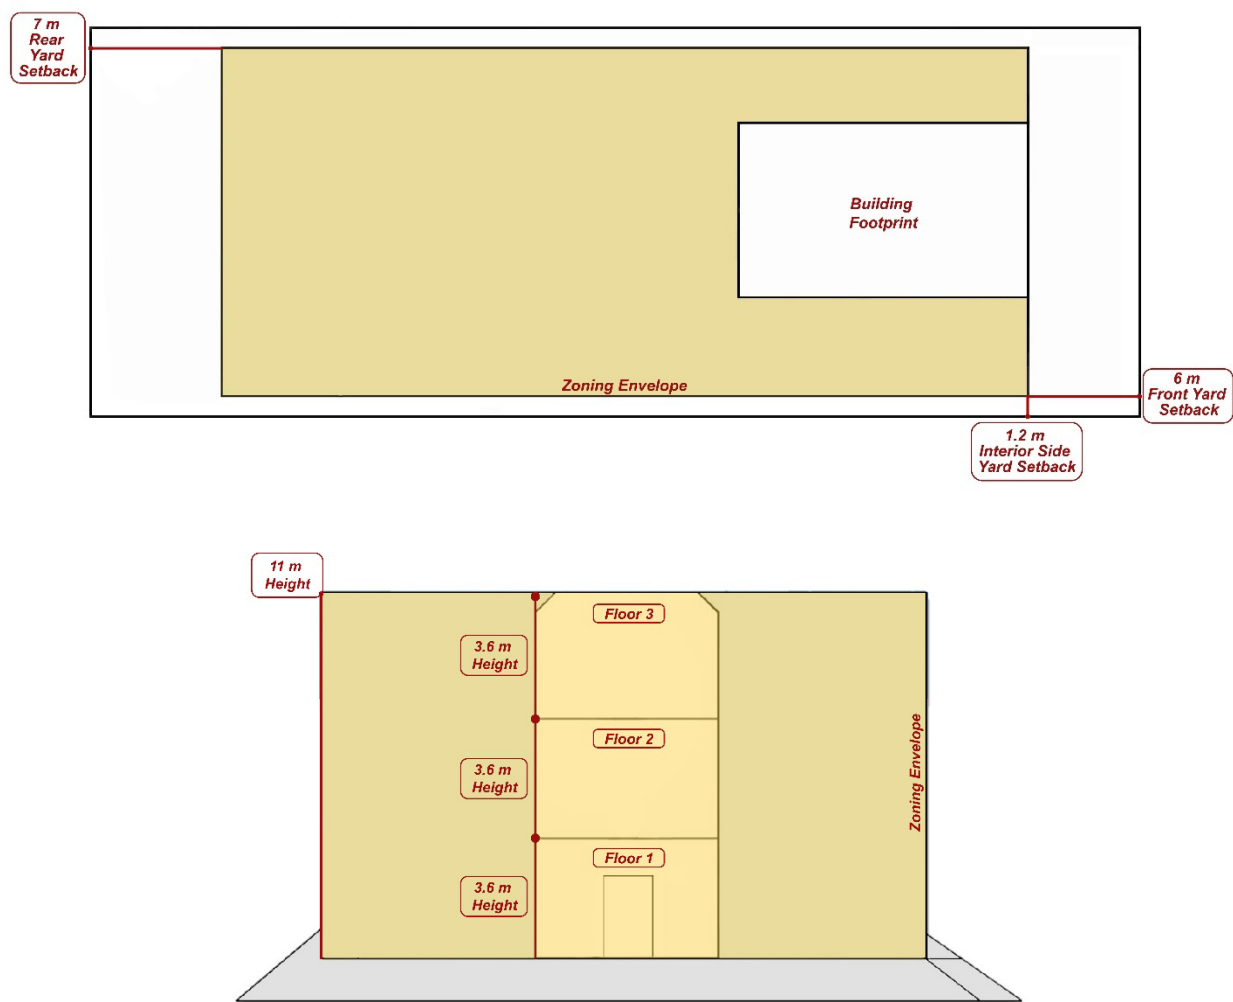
Typical Zoning Envelope for R1 Zone (Plan View & Elevation View)
